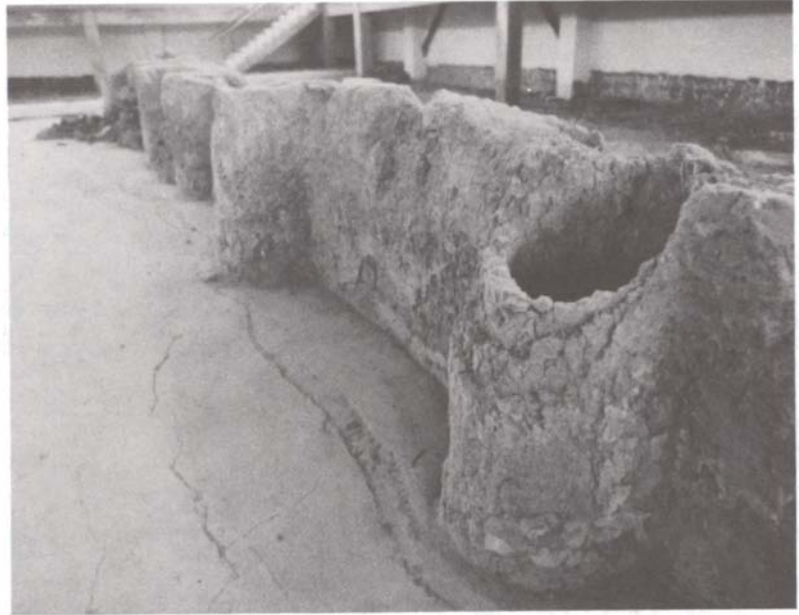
The wall and skeleton pillar on adherent wall of F₉₀₁ house-ruins after consolidation. (Photo, March 1990.)
